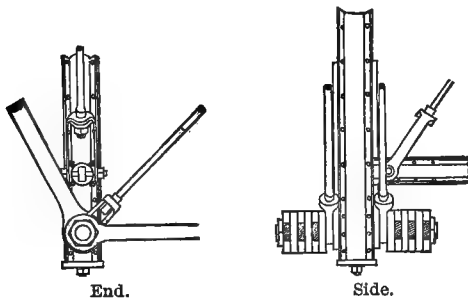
Deck Bridge Pin-Connections at foot of Post.
